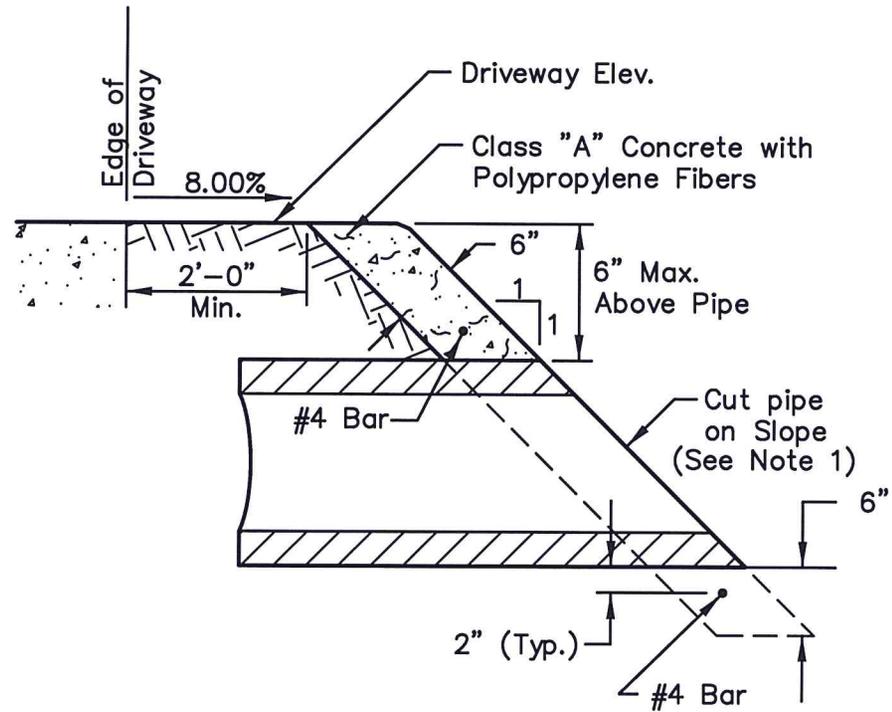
DETAIL OF STANDARD PIPE AND PIPE-ARCH CULVERT WITH BEVELED ENDS AND RIP-RAP
